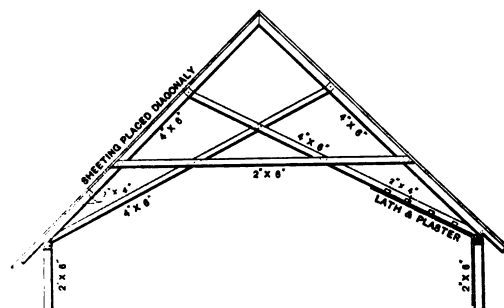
Truss Recommended by "A. H." for Small Churches.
